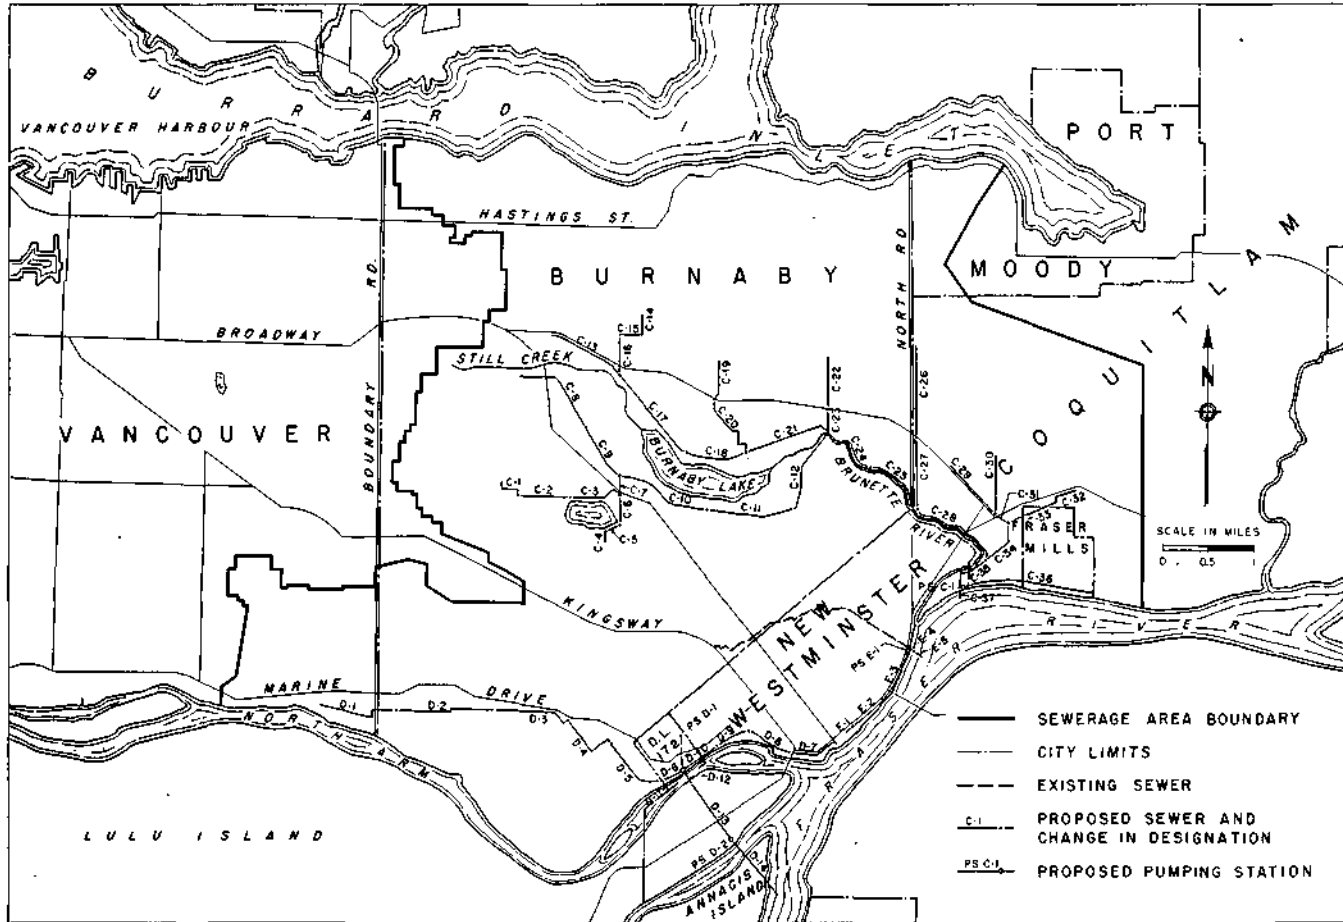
Proposed Layouts of Plan C, Plan D and Plan E - Fraser Sewerage Area
